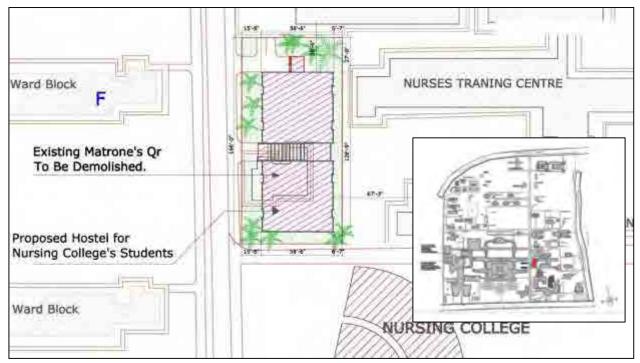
Candidate Site's Location and Layout Plan for Construction of the Nursing College in Rajshahi
